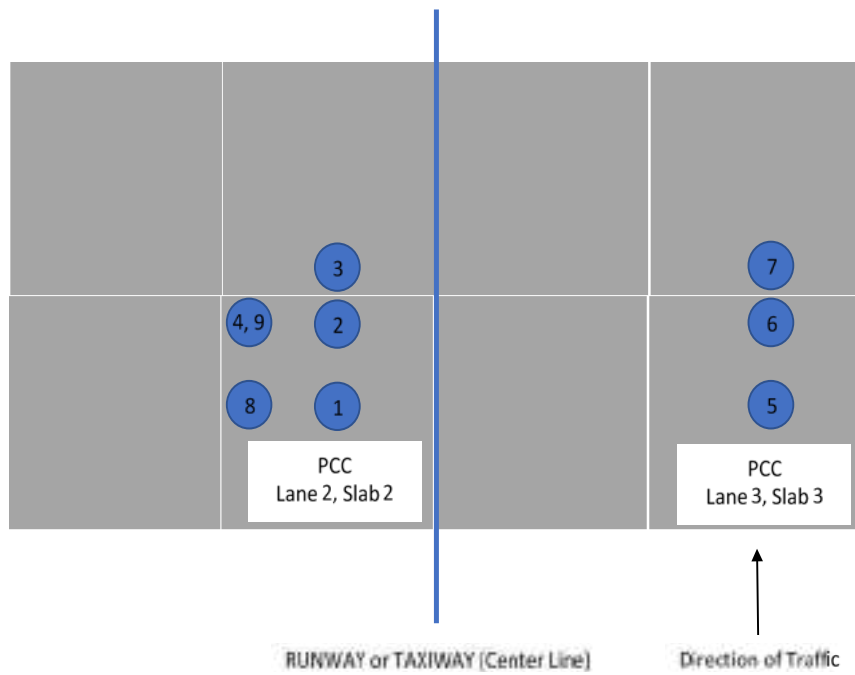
Testing Points Layout for PCC Runway or Taxiway with Centerline at Slab Joint (Offset Left)
